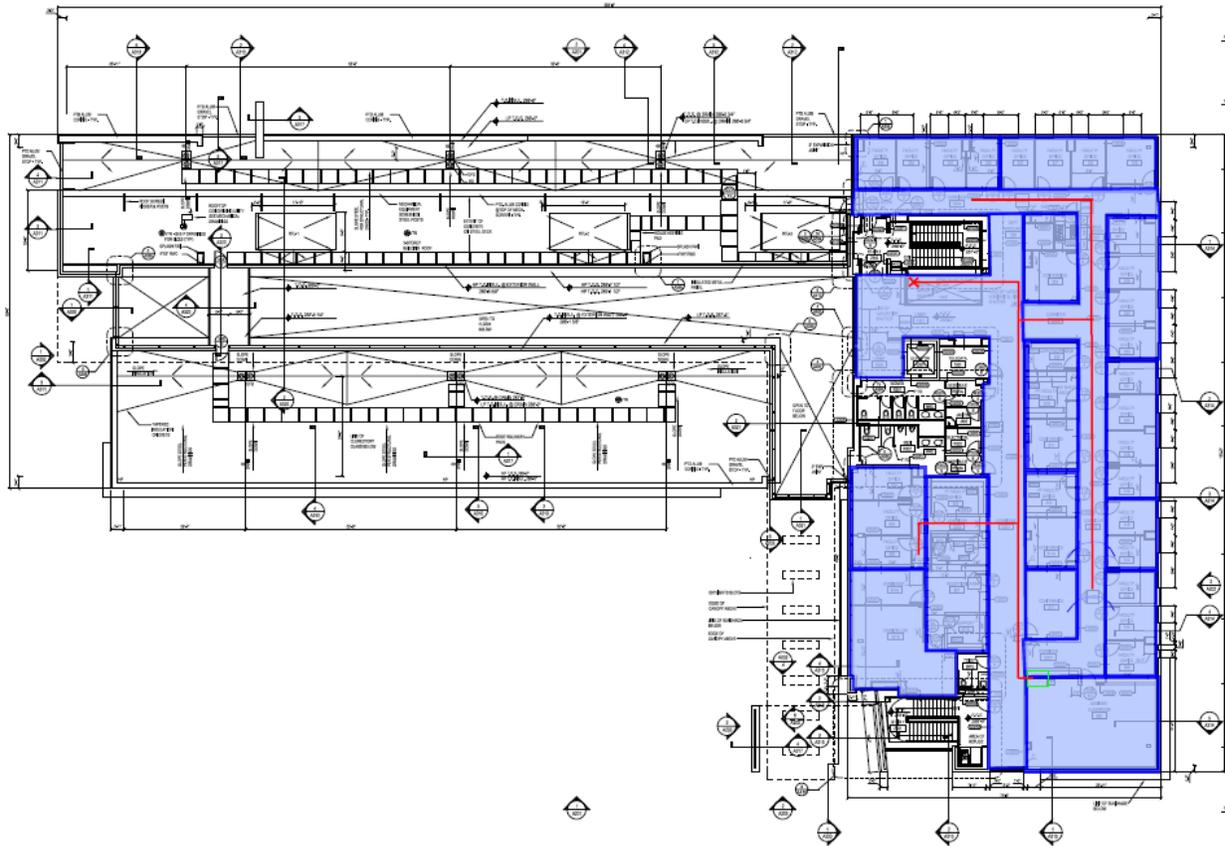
A diagram of the third floor HVAC zoning and piping distribution
